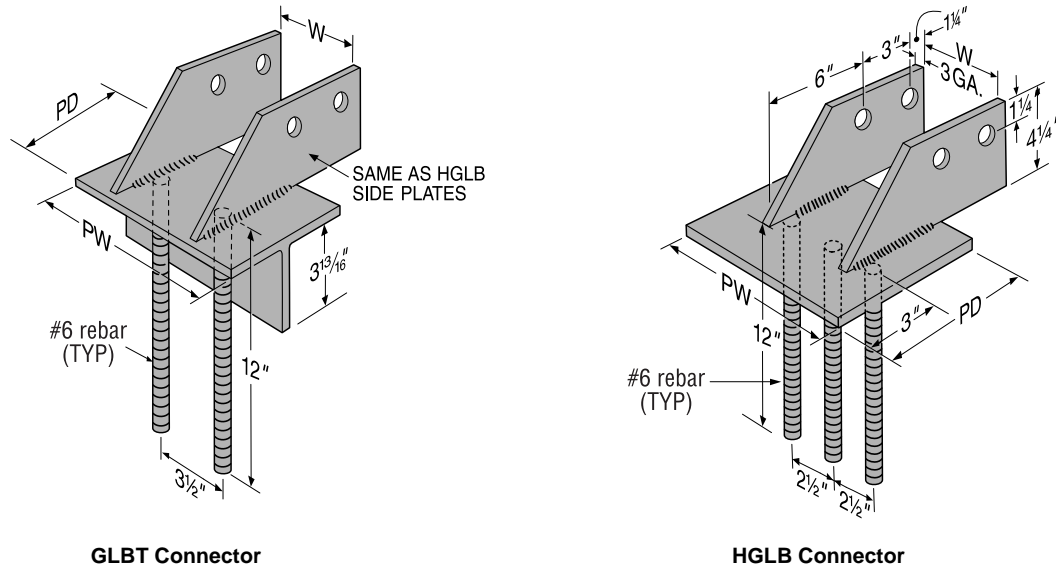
HGLB AND GLBT GLULAM BEARING PLATE CONNECTORS
